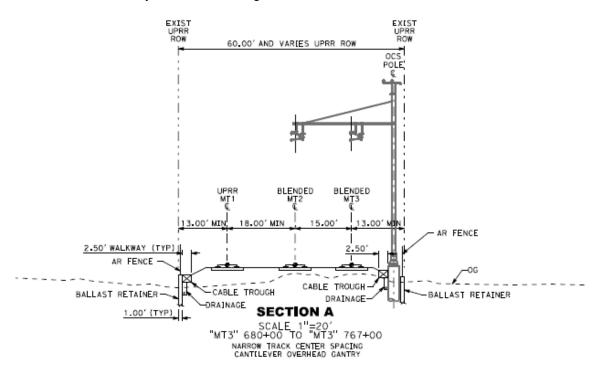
Typical Section in Subsection Morgan Hill and Gilroy (Blended At-Grade)
